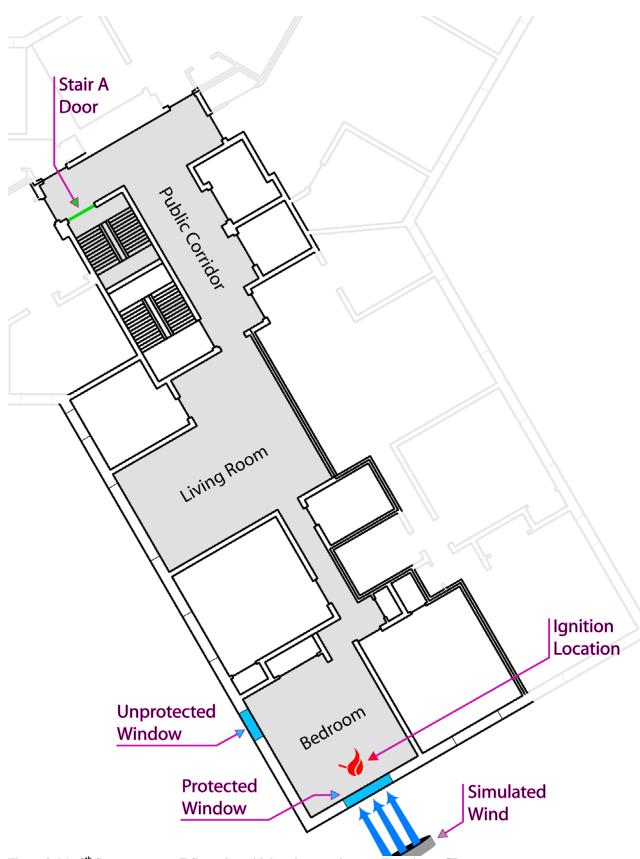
5<sup>th</sup> floor apartment E floor plan with locations pertinent to Experiment 5E
